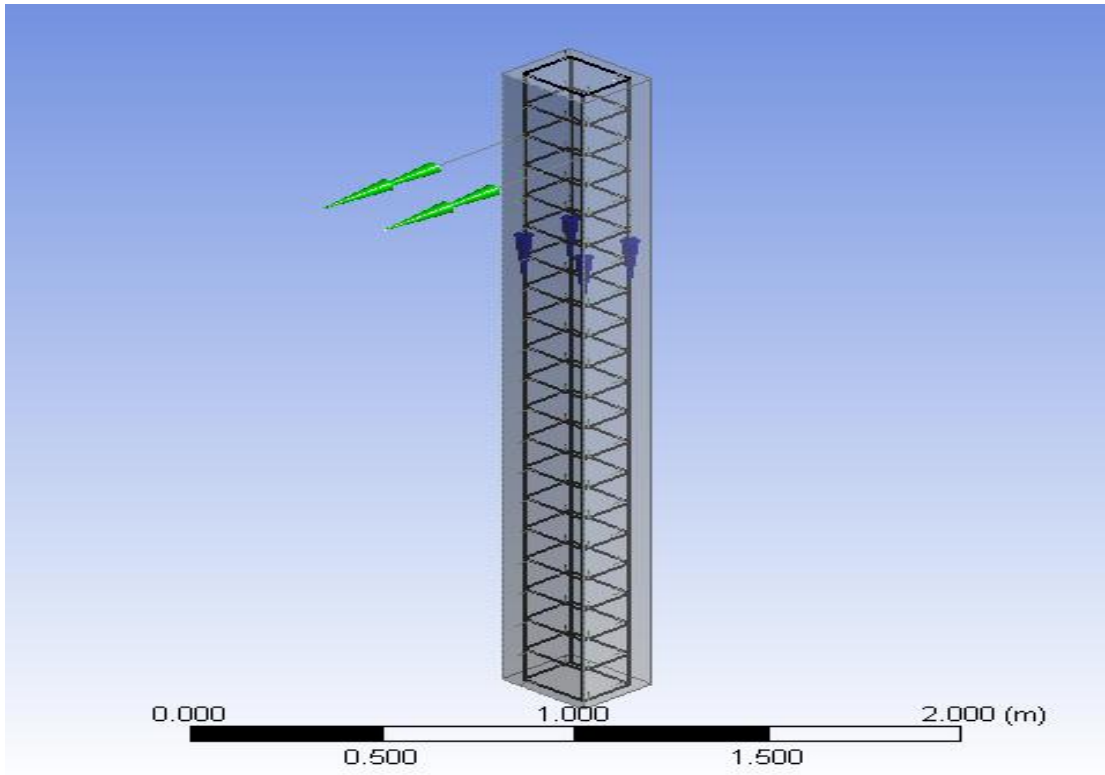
Geometric model and reinforcement detailing of Col. 5009 (ISO view)
